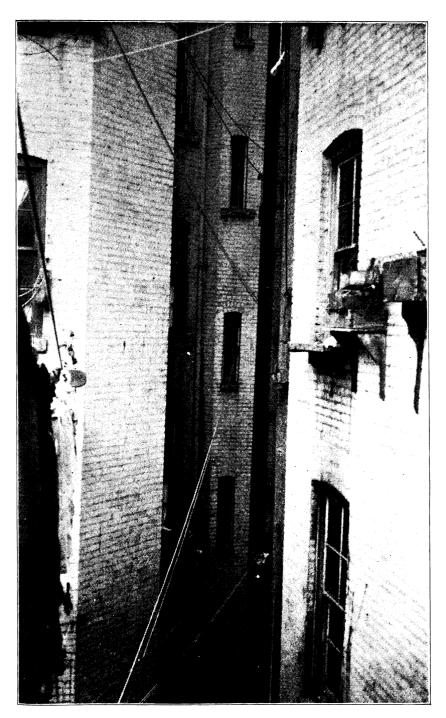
Showing open area at 13 Vestry street (continuous with 34 Laight street).
